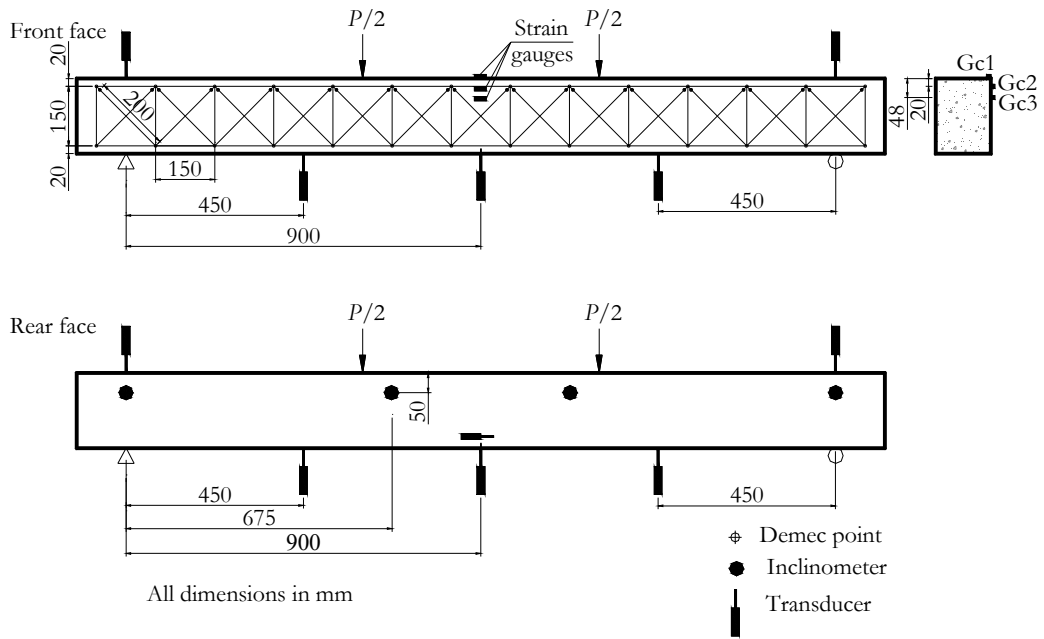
Instrumentation details for beam C3-212-D1-S.
